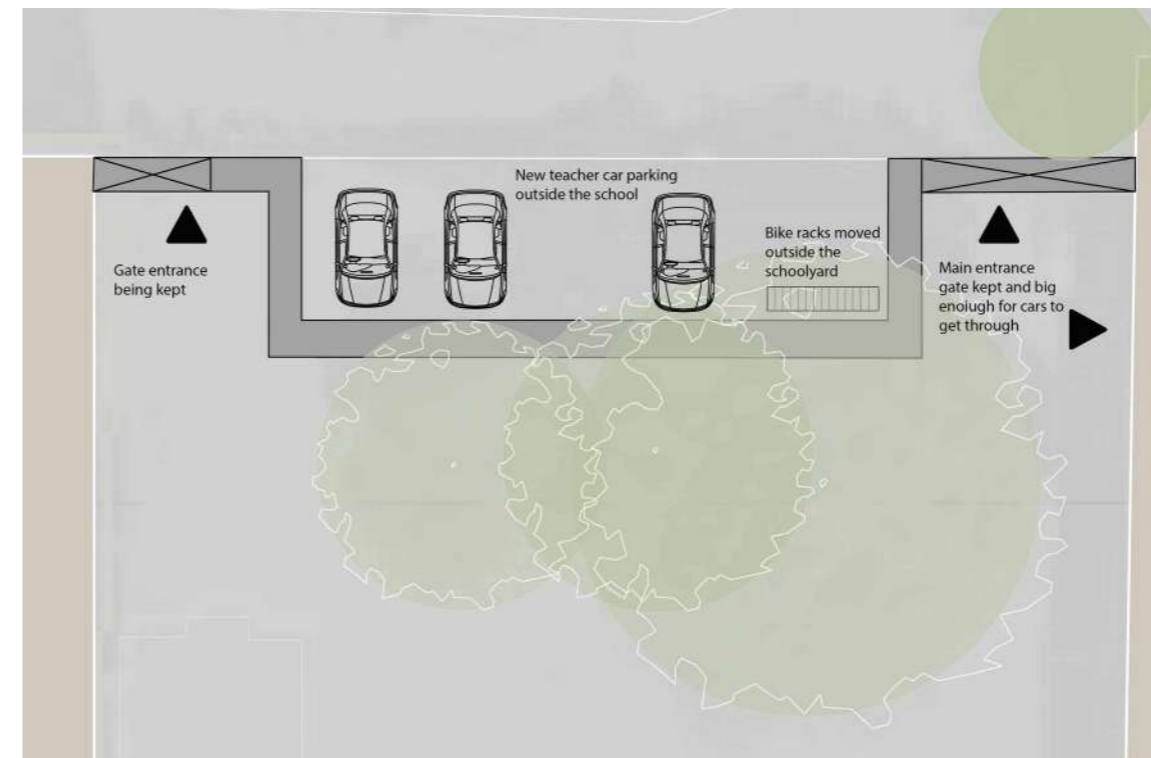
Zoomed-in detail plan showing the proposed reconstruction of the stone wall by moving it approximately 5 meters inward into the schoolyard. In that way, cars and bikes can be parked outside the schoolyard. Scale 1:200.
